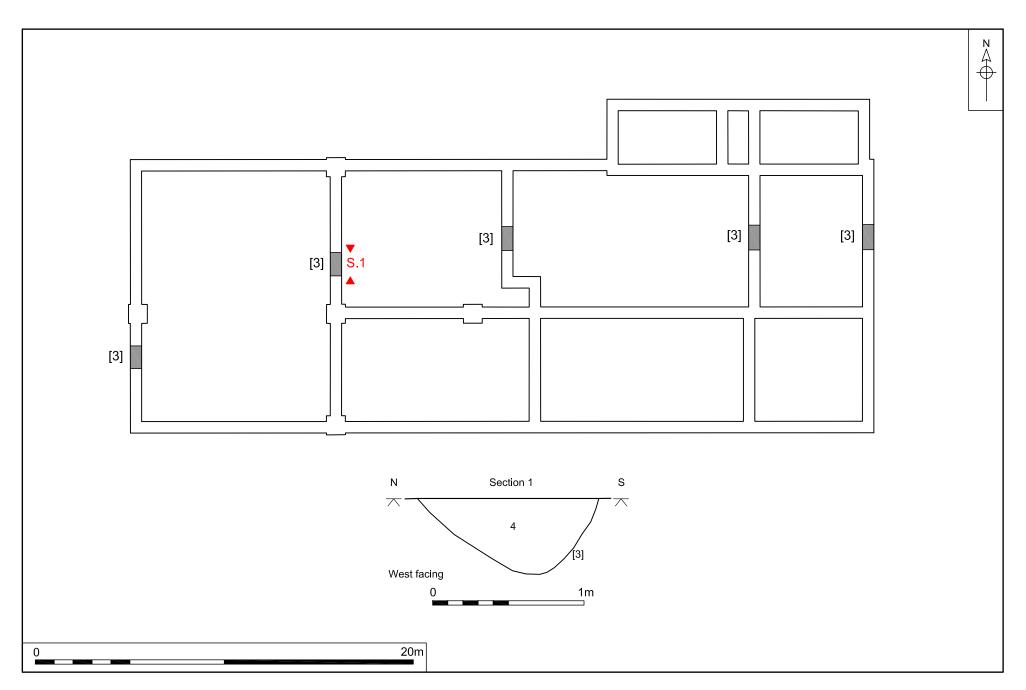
Plan of foundation trenches for pavilion and section 1. Scale 1:200 and 1:25
